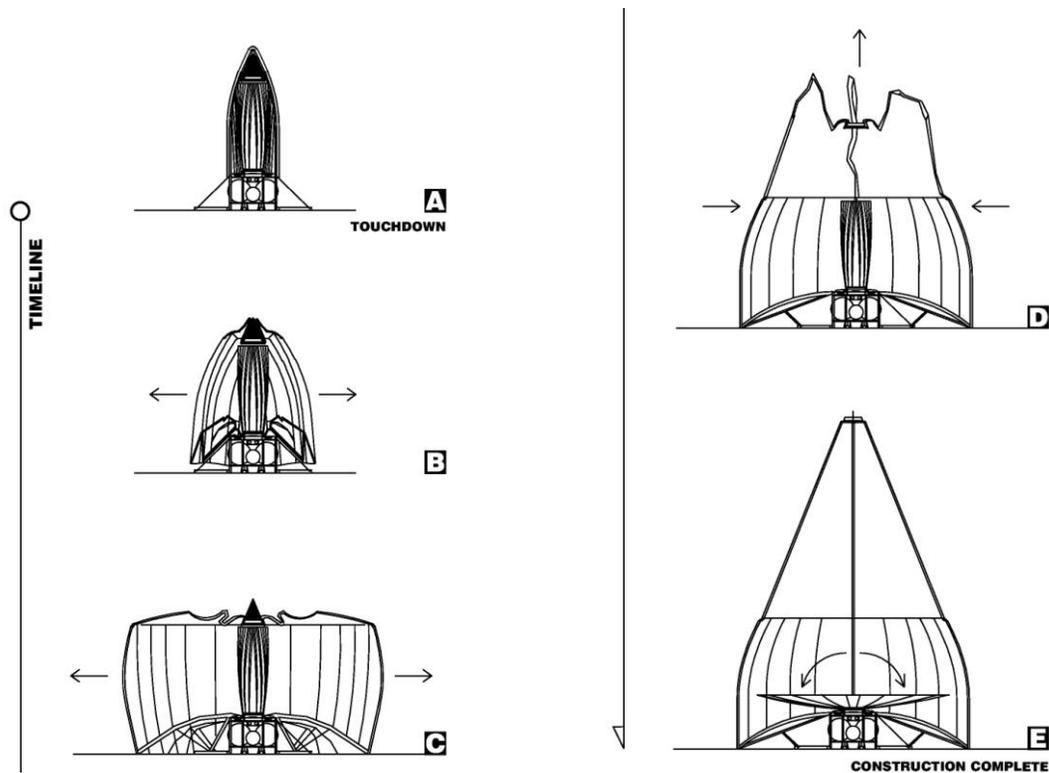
LB10 telescope section deployment scheme (steps A-E).
